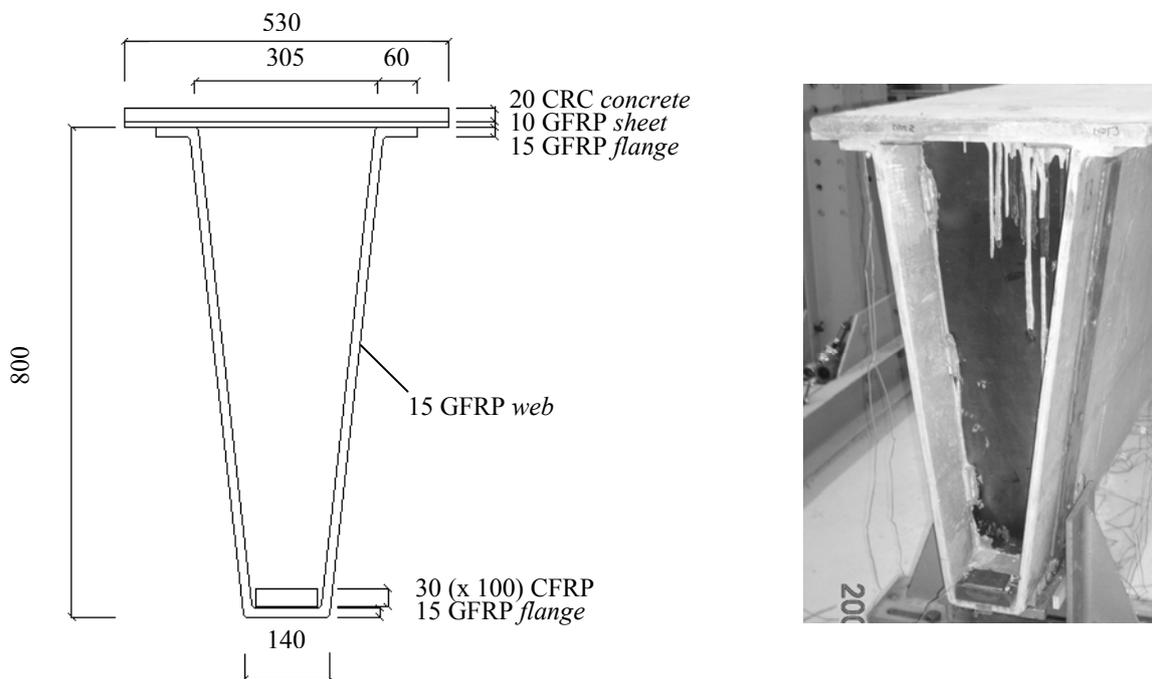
The cross-section of the prototype beam (to the left, dimensions in mm) and a picture showing the beam after casting of the concrete in the deck (to the right).
